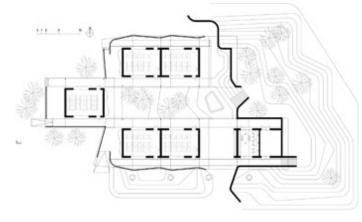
Ground floor plan of the Burkina Institute of Technology. The modular structures are arranged to form a central courtyard. © Kéré Architecture
